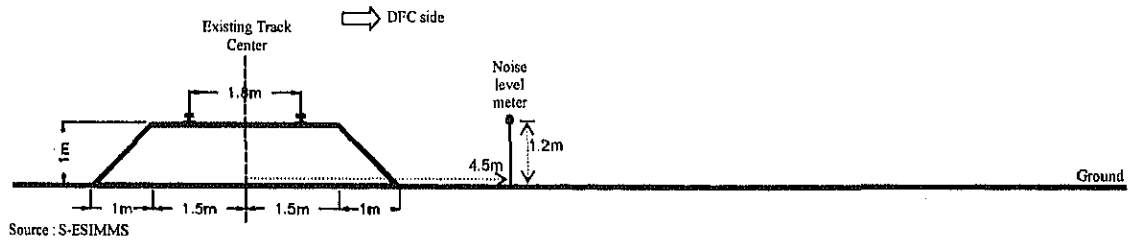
Cross-section view of N-3 Measurement Site in Narnaul
